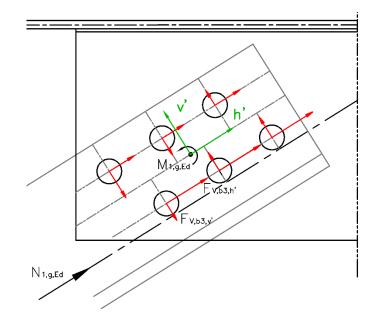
Loading on bolts (forces in the {h', v'} system) - regarding the gusset
